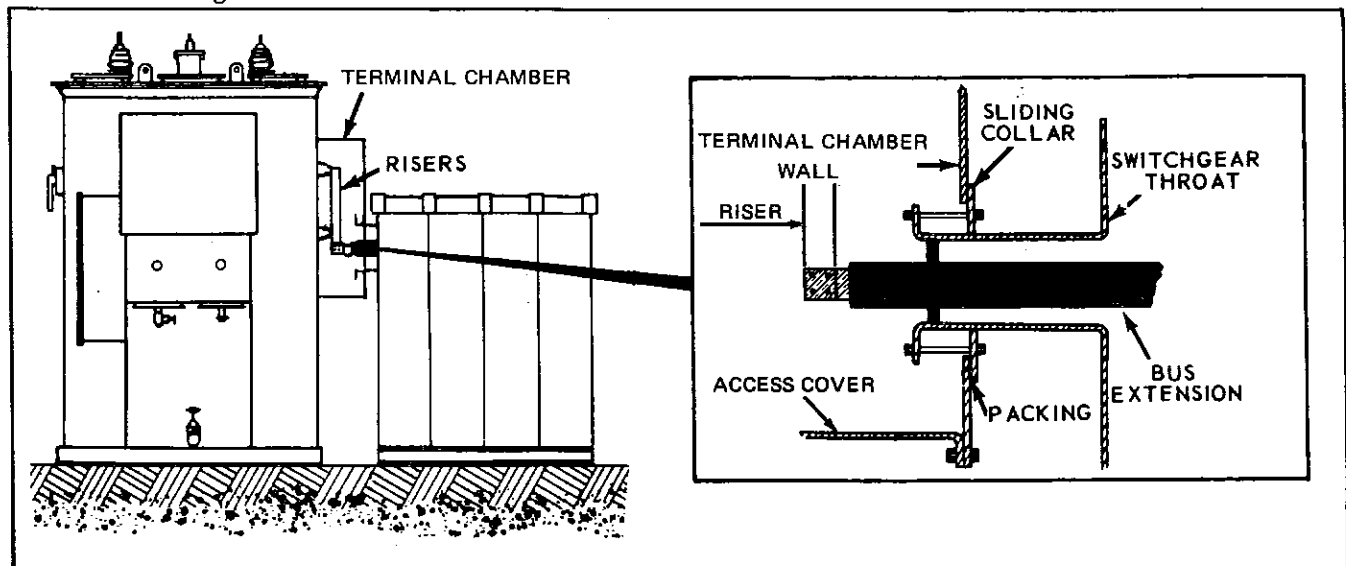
Connecting Transformer and Switchgear on Typical Outdoor Installation
